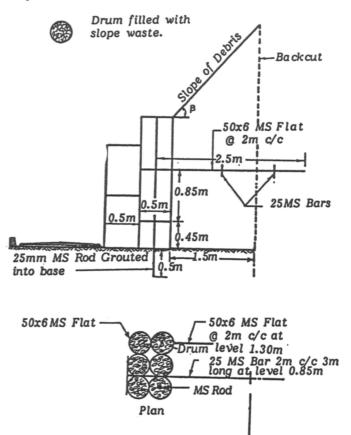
ANCHORED DRUM DIAPHRAGM WALL BUILT OF SLOPE WASTE AND EMPTY BITUMEN DRUMS
